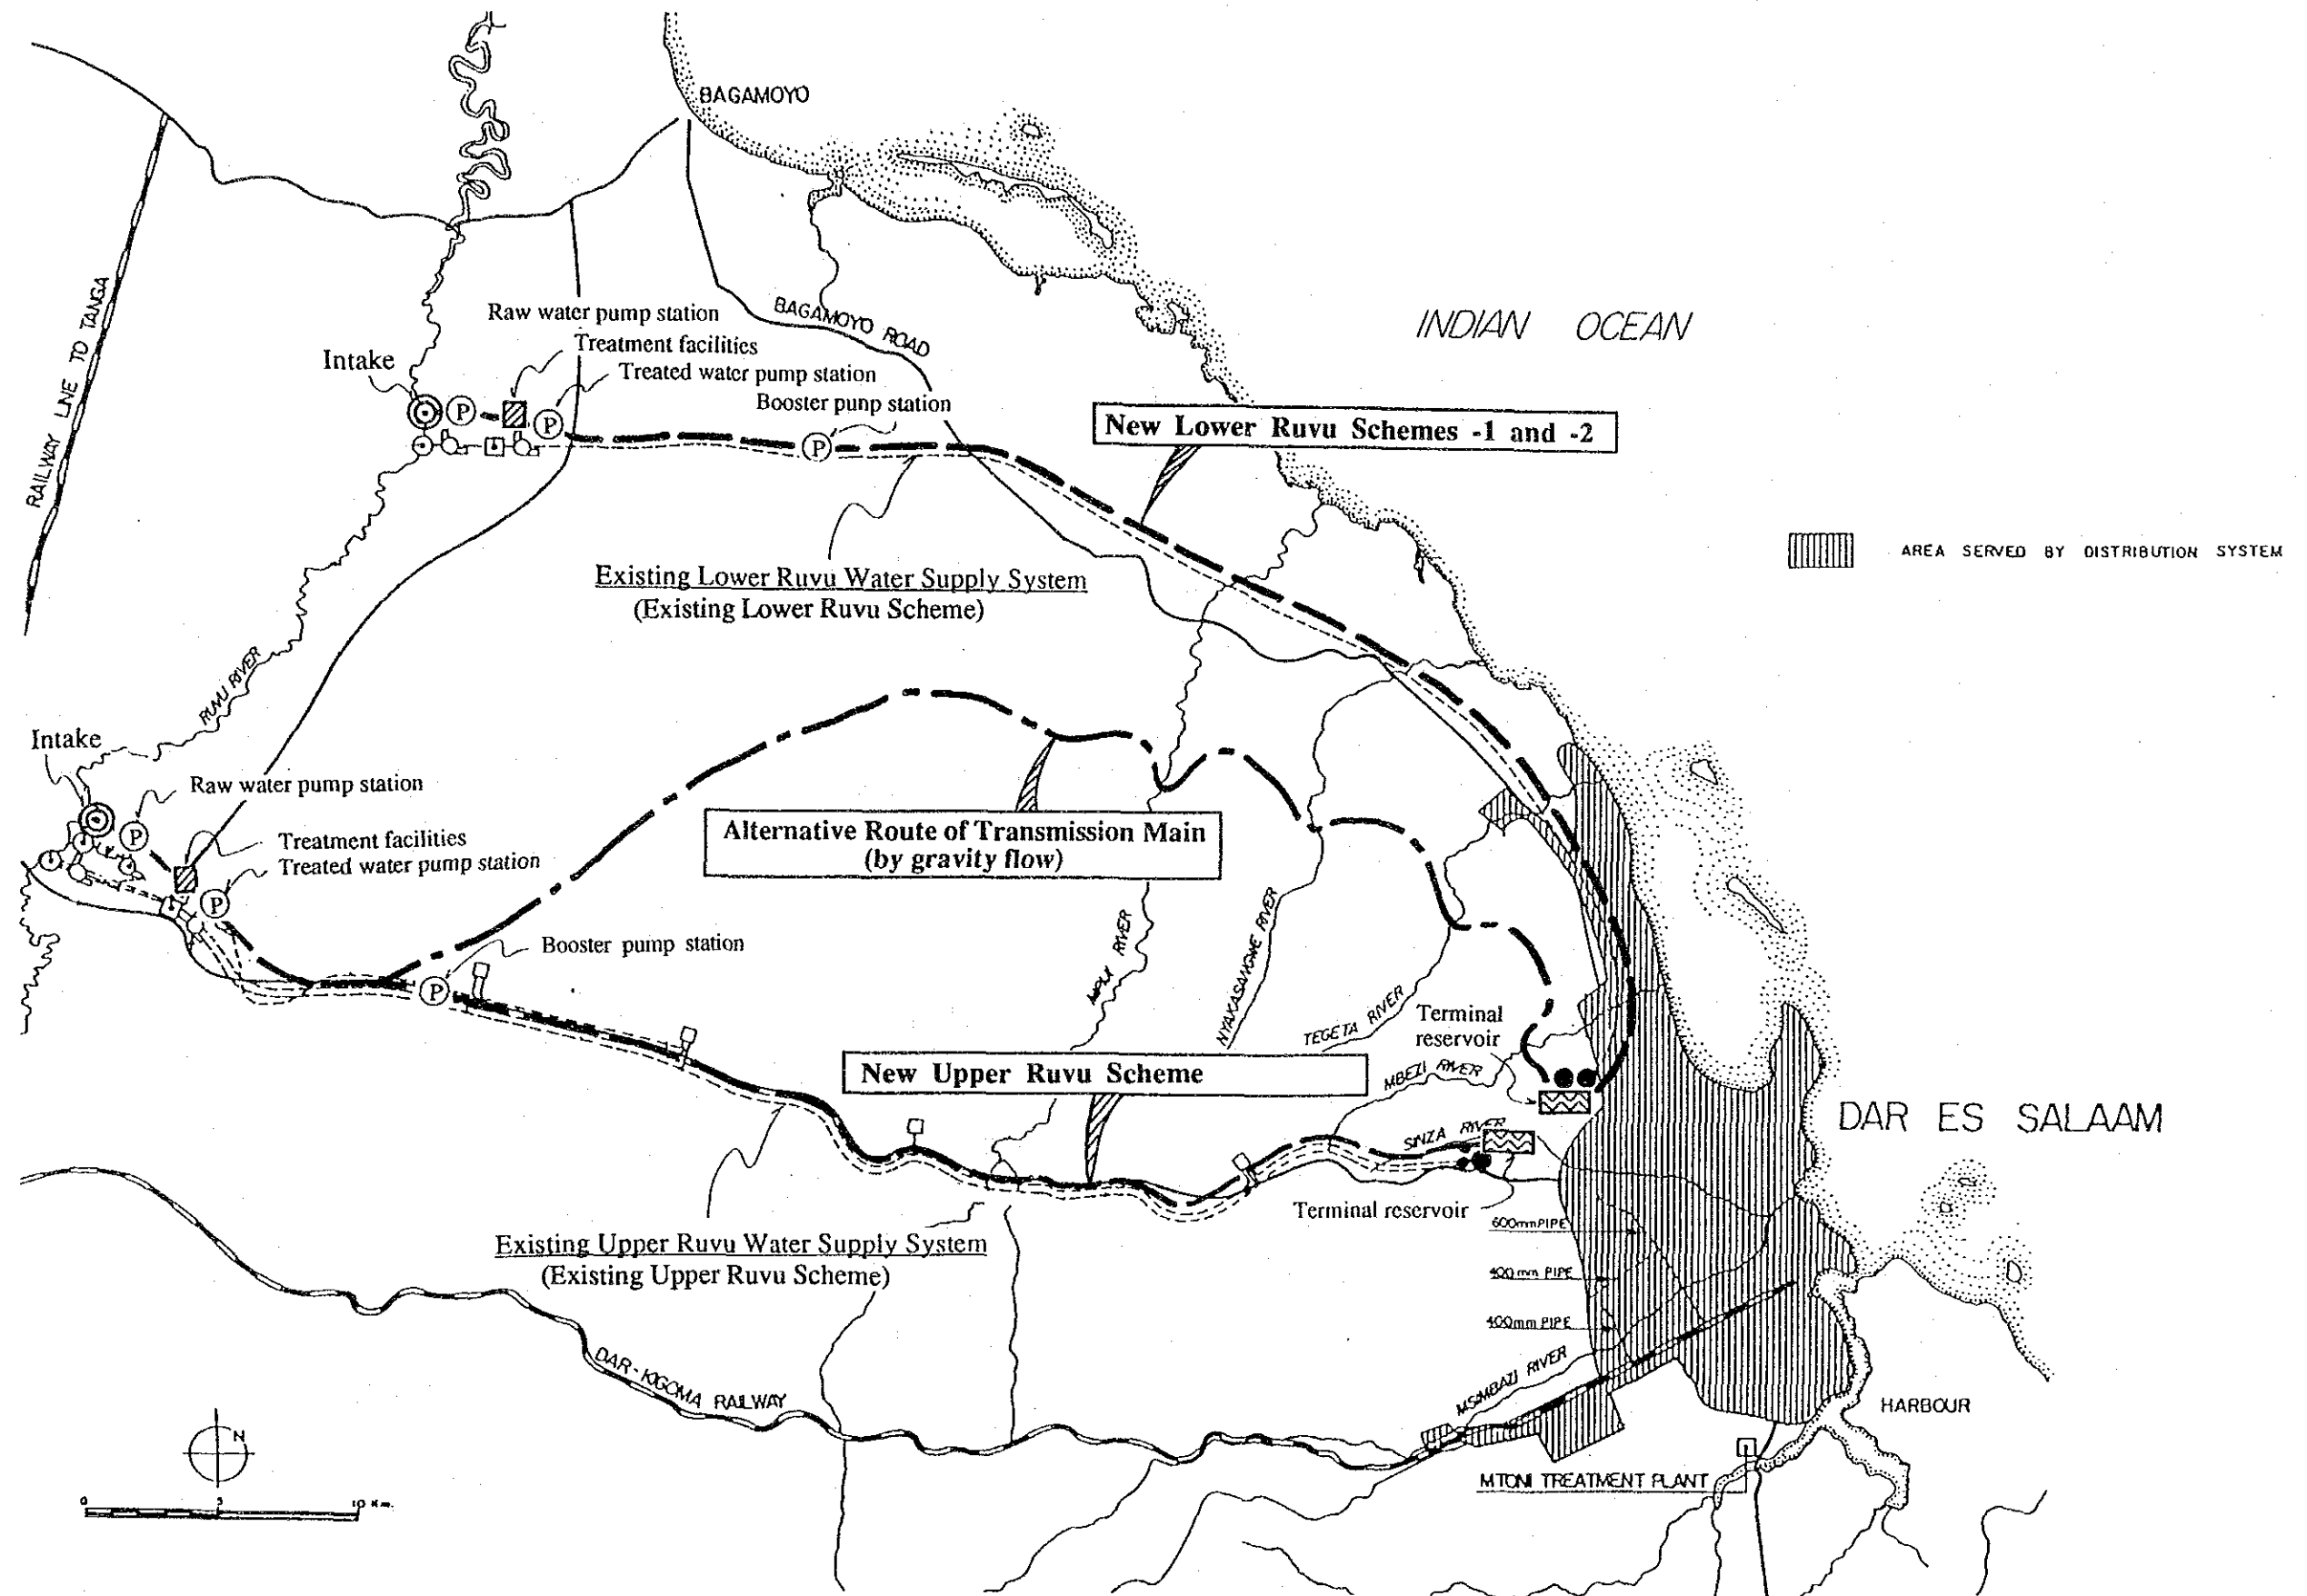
LAYOUT PLAN OF NEW WATER CONVEYANCE PROJECT
